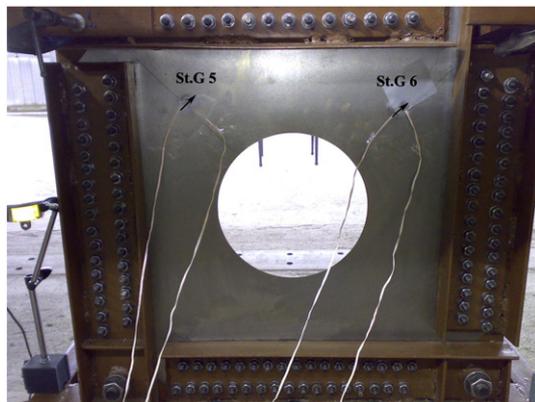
Installation place of the transducers and the strain gauges in the SPW1 specimen.
